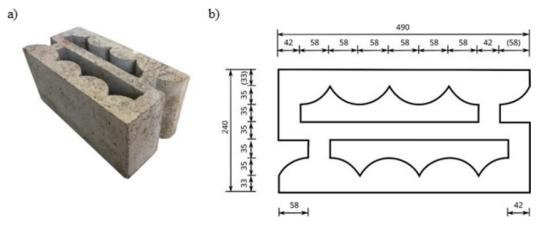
APS Openwork Wall Block: a) view, b) dimensioned horizontal section
